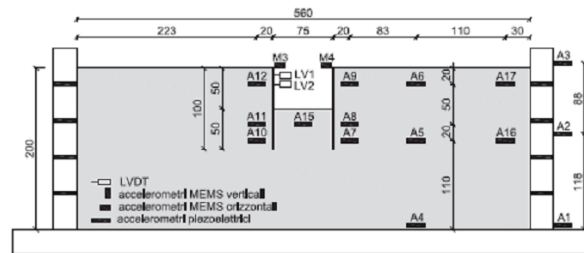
Layout of test dry CW1 (Conti. 2010).
